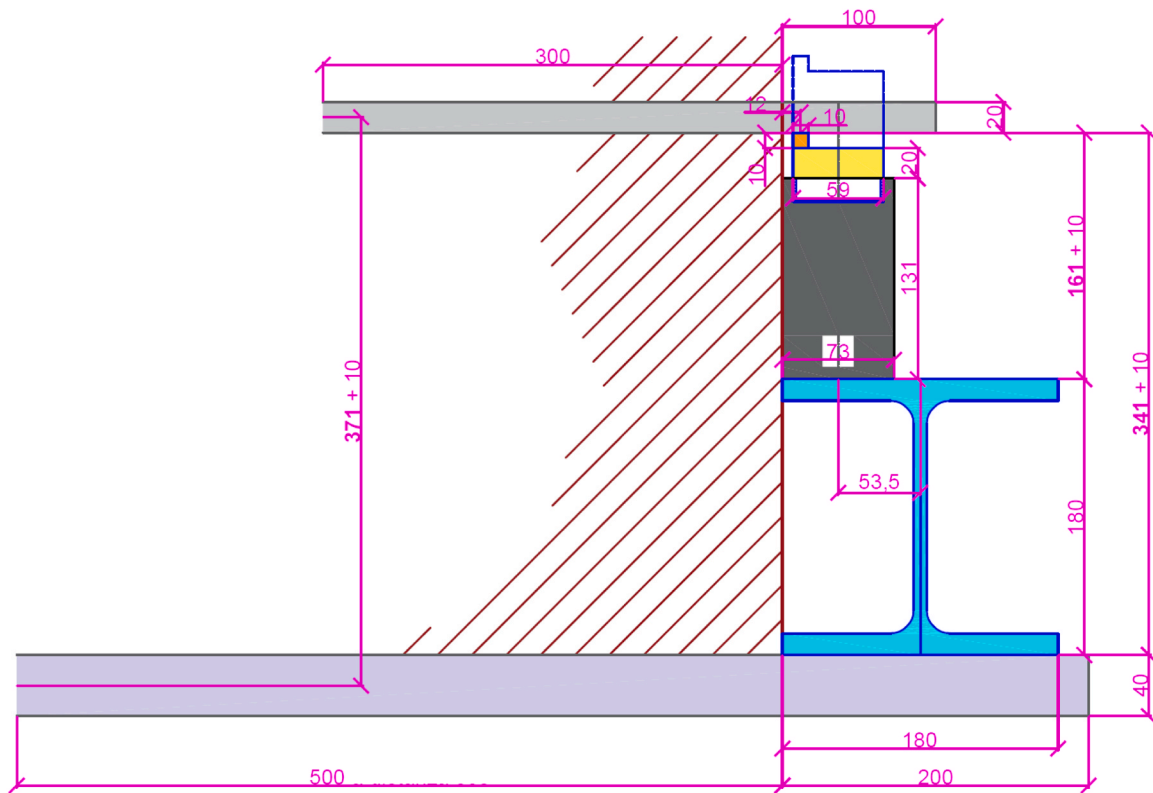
Test set-up represented for the anchor with $\Omega = 20$ mm and $L - e = 300$ mm: cross section of the concrete wall and longitudinal section of the tested anchor embedded into the wall (the anchor above in the drawing). The figure shows the jack (a cylinder with a head). The jack applies the shear force to the bottom of the anchor through a steel bar of square section, which reduces the eccentricity of the shear force. The figure also shows the I-section steel beam that collects the reaction force of the jack, which is supported by two anchors of large diameter and long embedded length.
